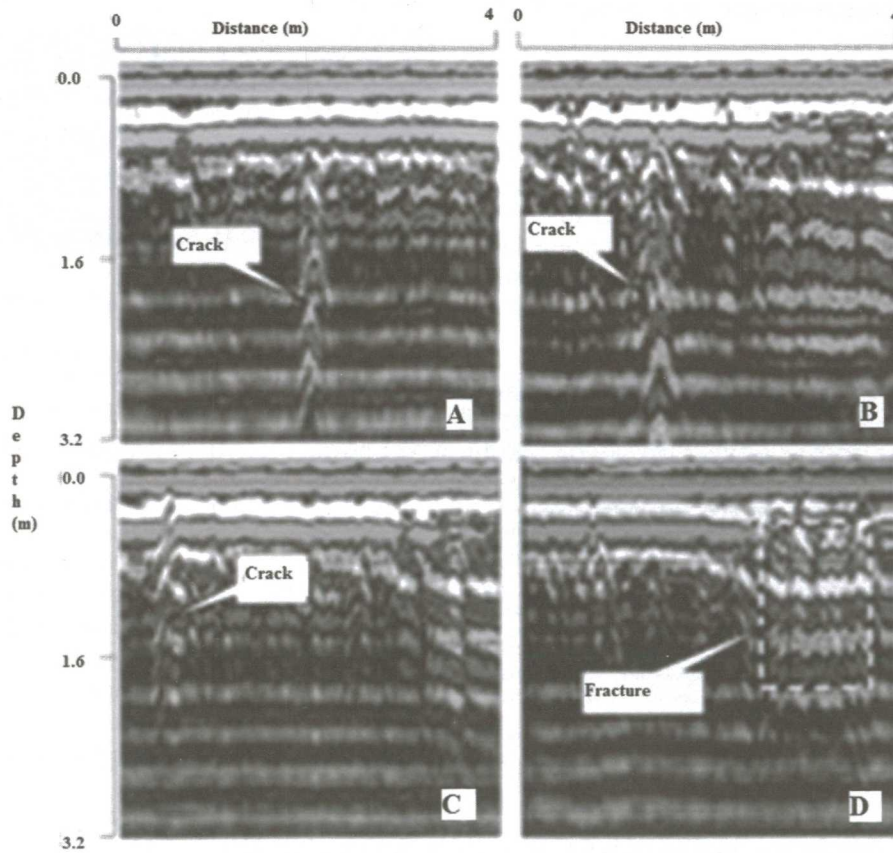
GPR images showing cracks and a fracture zone in sloping clay core.
